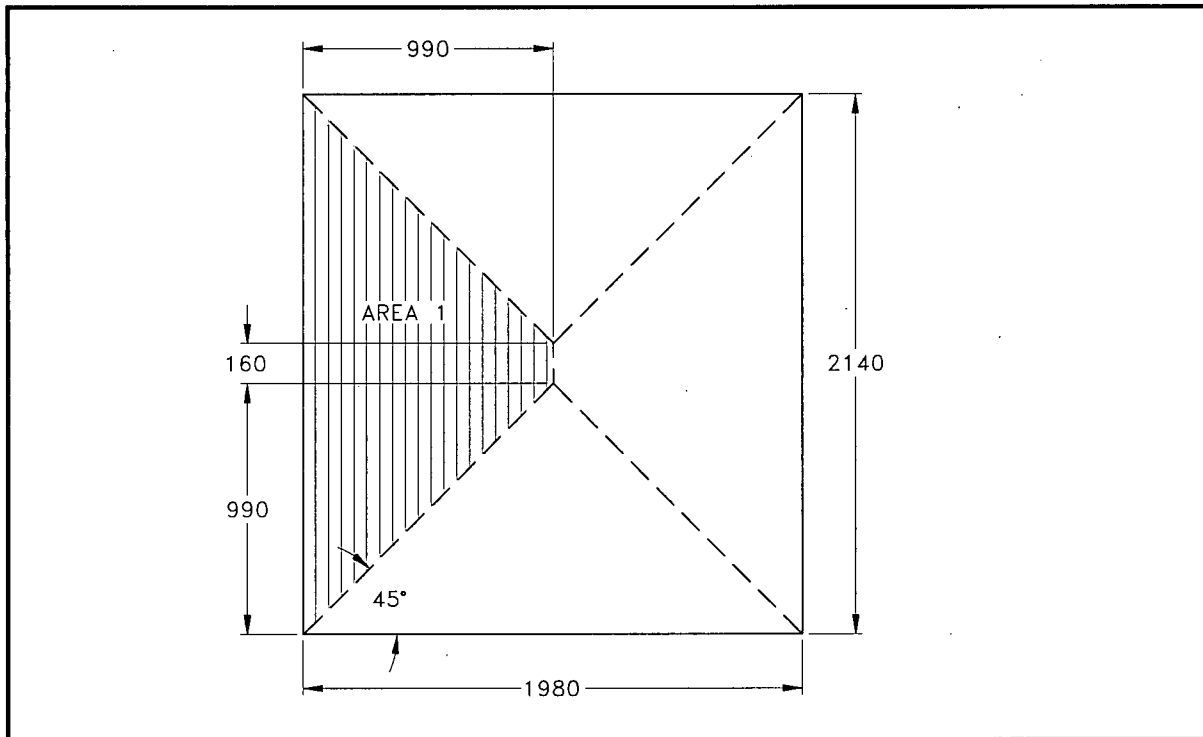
(c) – View of Area 1 on End Wall Used to Calculate End Edge Load on Side Wall
